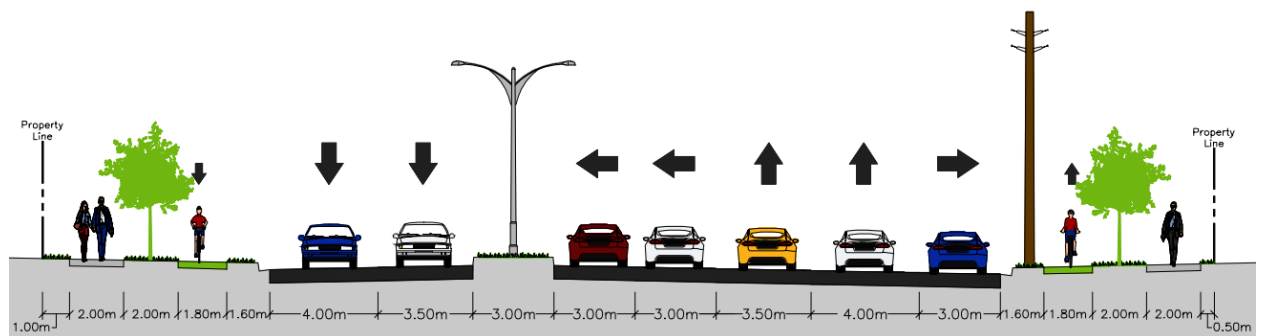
Preferred Richmond Street Cross-Section, South of Fanshawe Park Road
